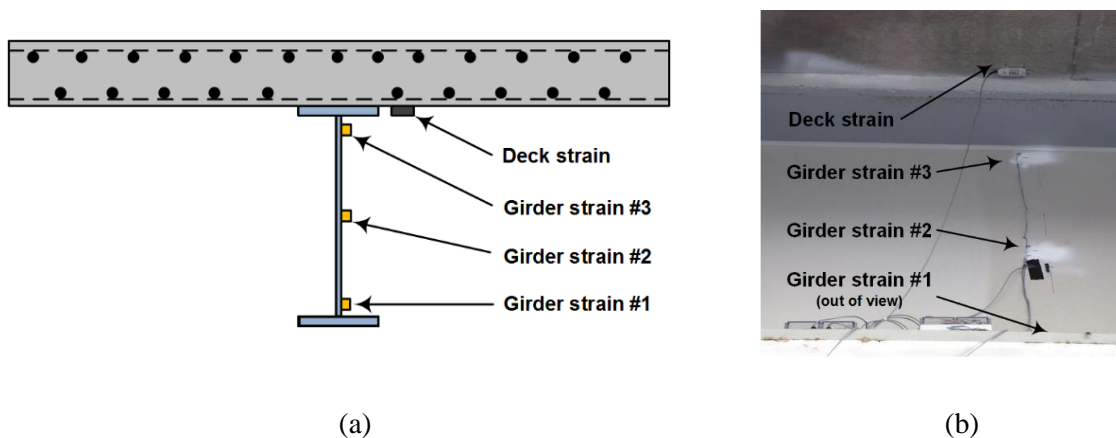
Steel-concrete deck section instrumentation: (a) section strain gage layout; (b) actual sensor installation.
